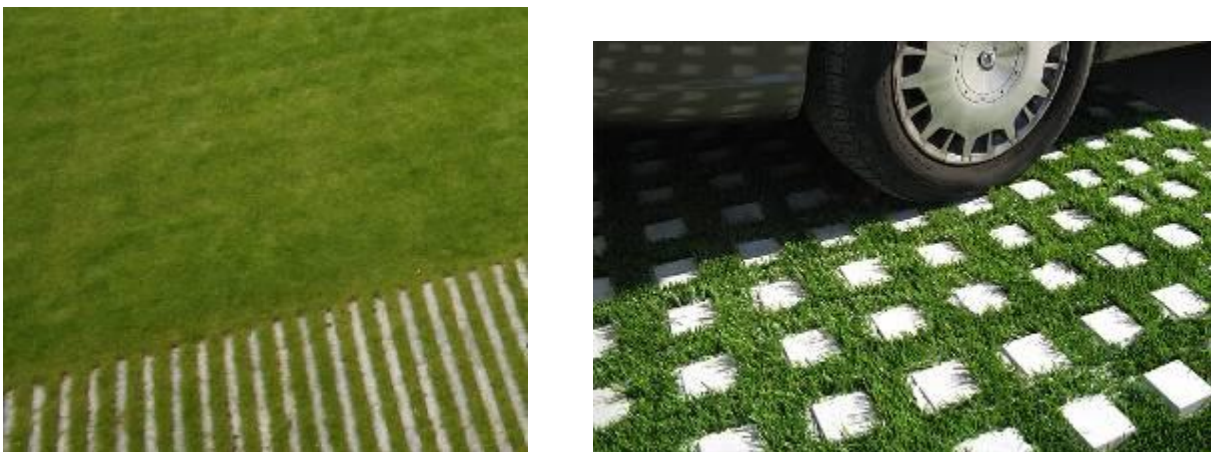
Integrating paving and soft landscape: (left) natural stone in lawn, (right) reinforced grass using 'Checker Block' concrete modular product.
